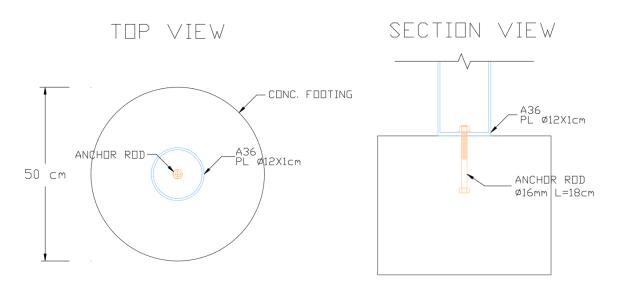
Final Dimensions of the Base Plate and Anchor Rod Components
